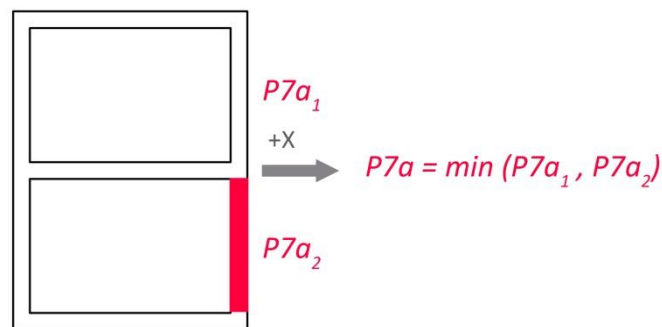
4: In the case of walls presenting different ratio P7a of wall openings in a specific direction, the minimum value should be adopted in order to be on the safe side (plan view)
